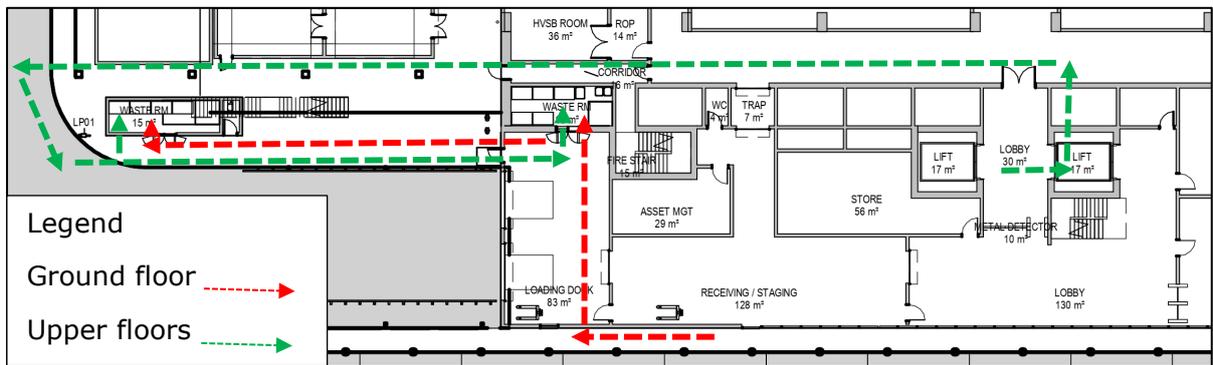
Buildings B and E - internal transfer of waste and recycling from ground floor and upper floors
